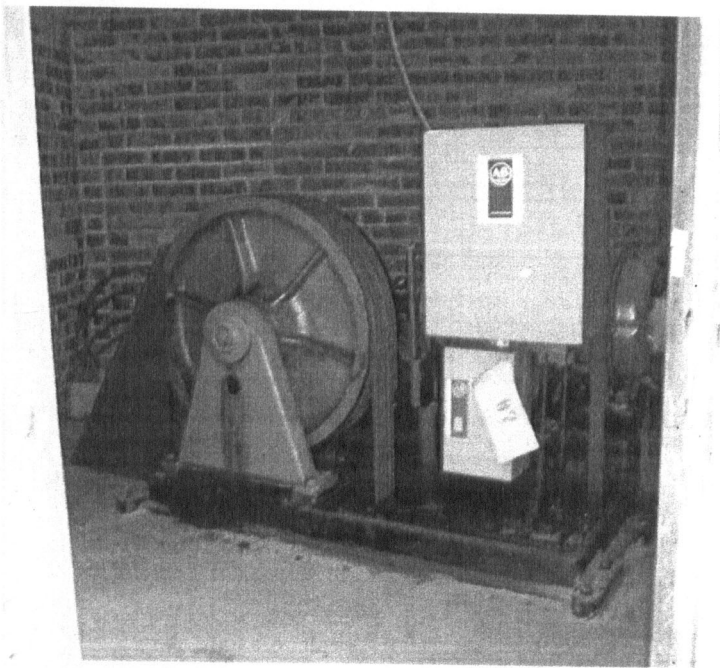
Facing east; view of silo brick wall in Building 5A.
